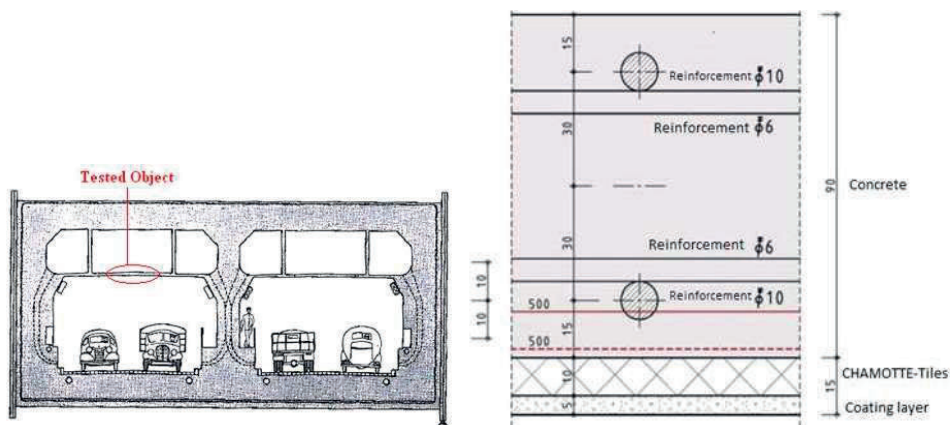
Cross-section of the land tunnel and cross-section of the tested false ceiling
